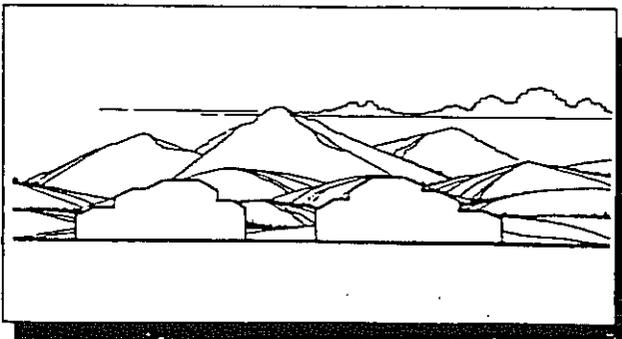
Building Massing, Roof Lines and Mountains Backdrop
